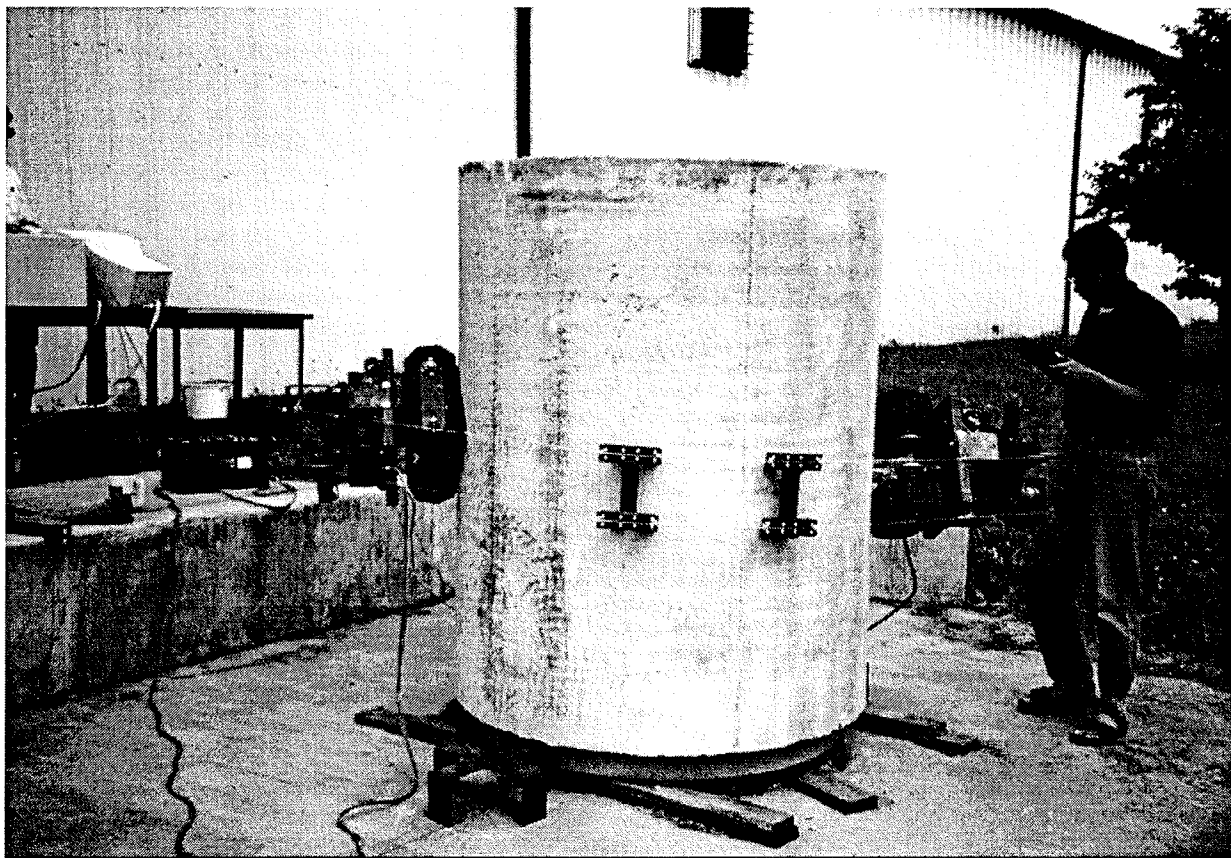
Early Prototype of the Robotic Inspection System
